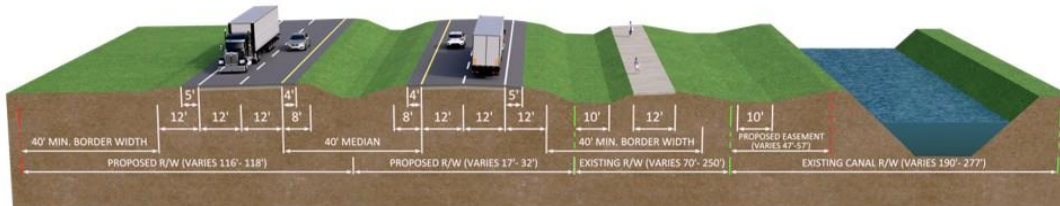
Preferred Alternative Roadway Typical Section: Lonesome Island Road (Begin Project) to West of Harney Pond Canal C-41
